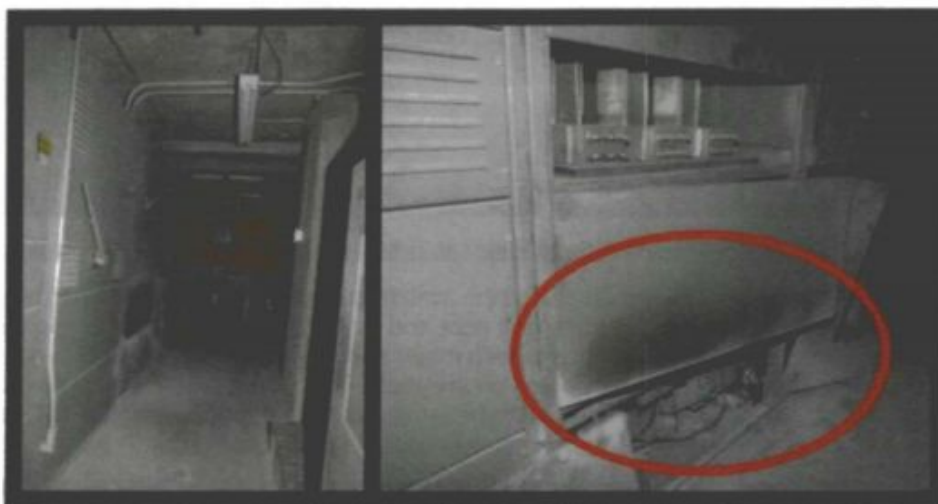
Entrance to Electrical Room in Basement/Fire Pattern on Switchgear Cabinet - Jimg # 1794/2141
